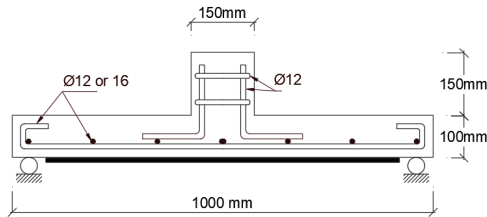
CFRP strengthening sheet applied to tension side of flat slab specimen [32].
